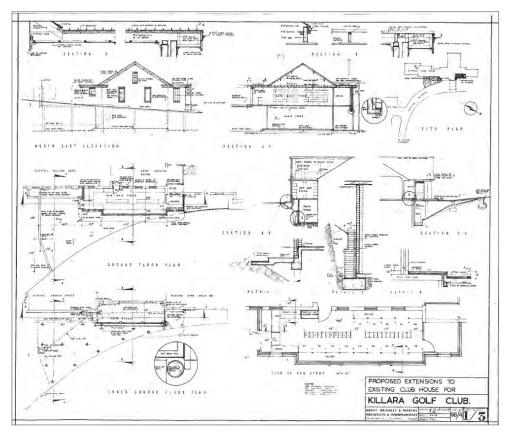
Drawings for Bar Store additions, 1968, by Davey Brindley and Vickery.
